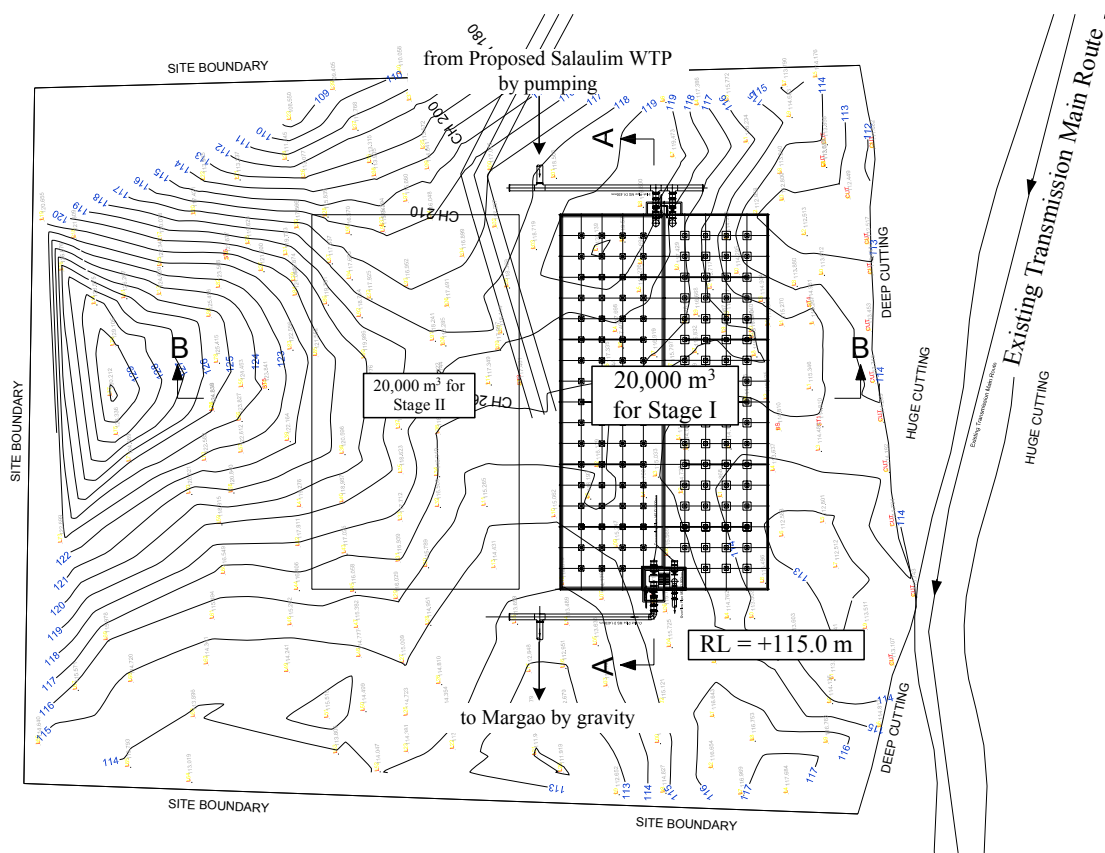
General Layout Plan of Proposed Sirvoi MBR
